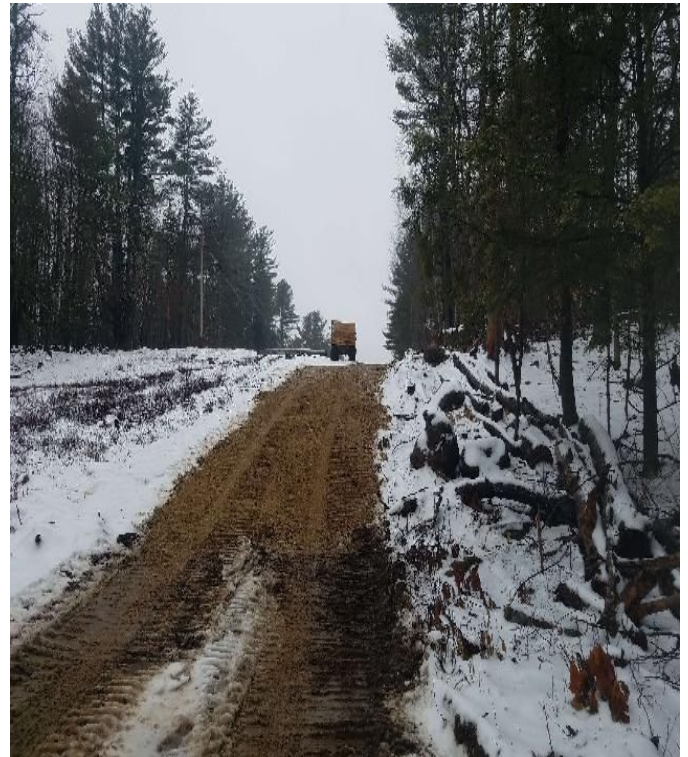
Crew installing stone on sloped sections of the access road between Strs. 52-58 for concrete truck access. This area is next to Str. 53. Viewing west. (02-11-20).
